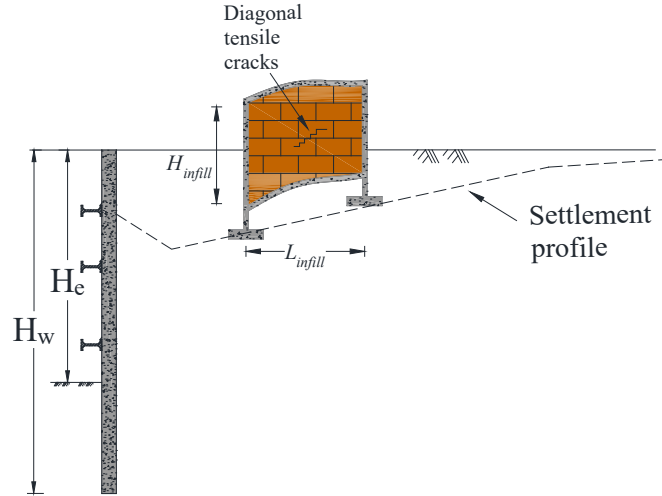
Schematic excavation and adjacent building for the example of the proposed methodology
